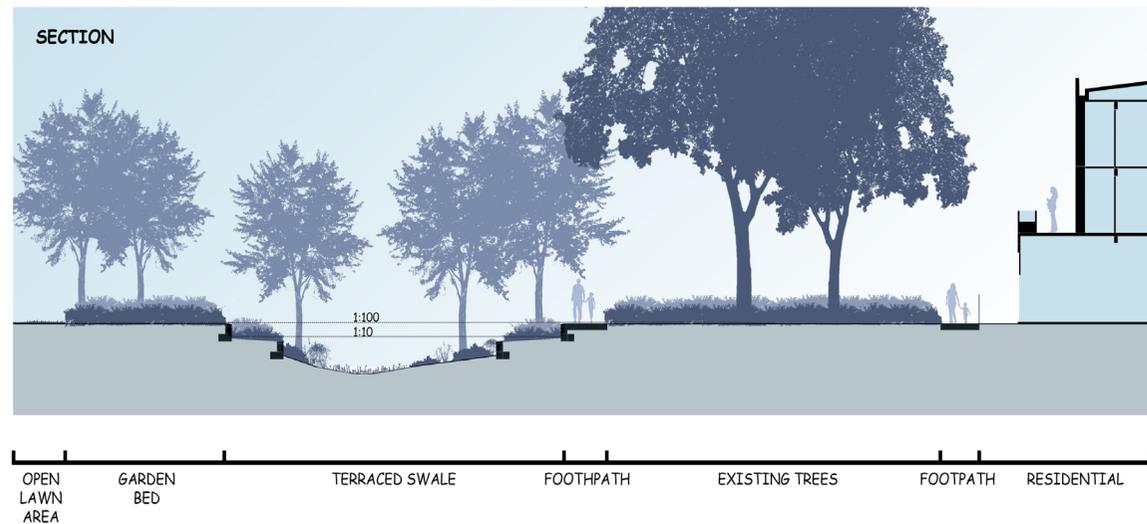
Concept Design for POS 1 and indicative cross section taking into account drainage, tree retention and future abutting residential development.
